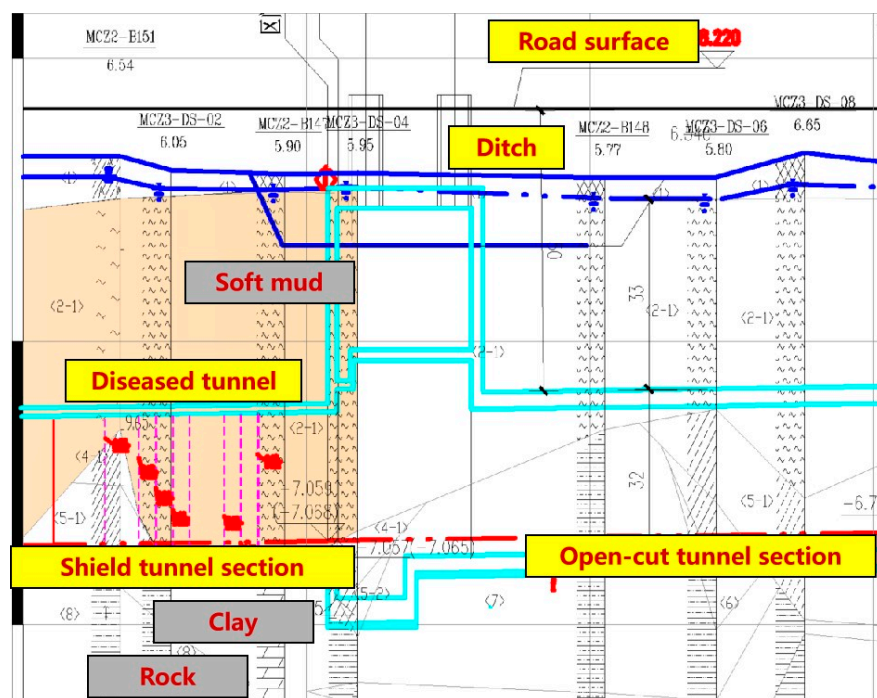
Cross-section of the defected tunnel and the stratum in which it is located.
